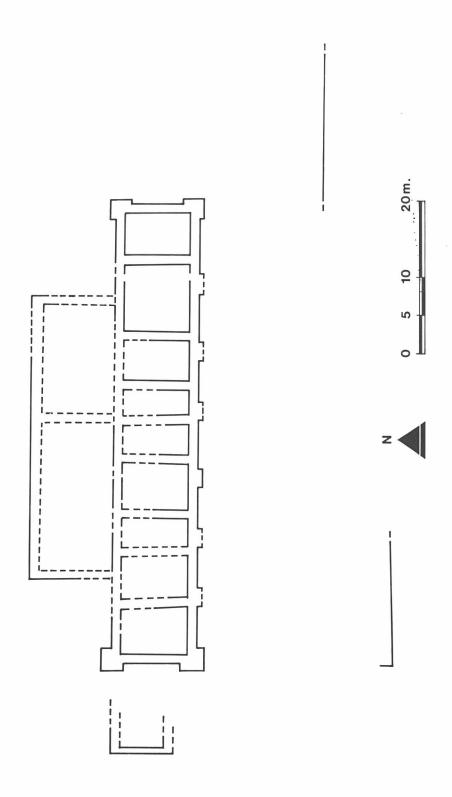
Plan of Bahçecik 2 stage-post.
